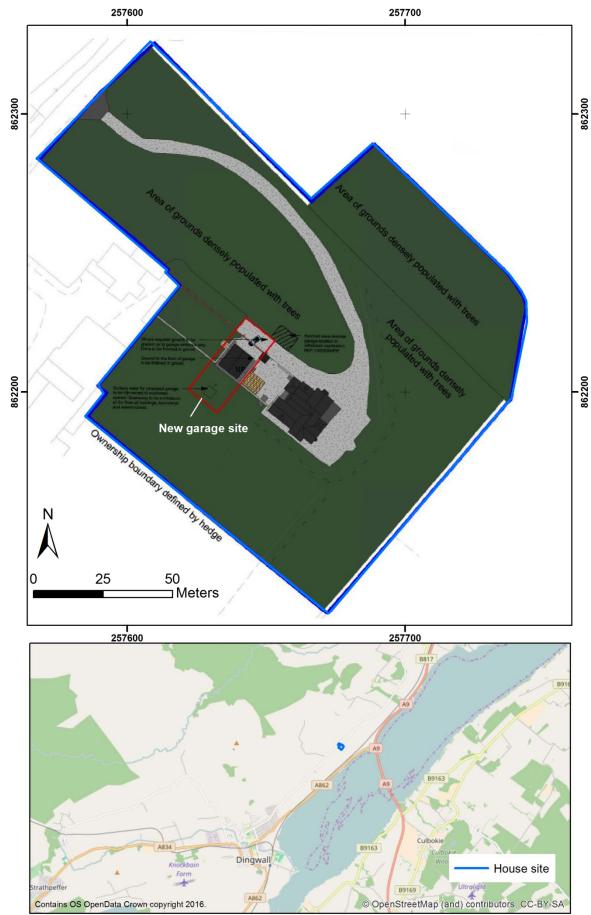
Site plan showing the location of the new garage site (plan provided by Reynolds Architecture)
